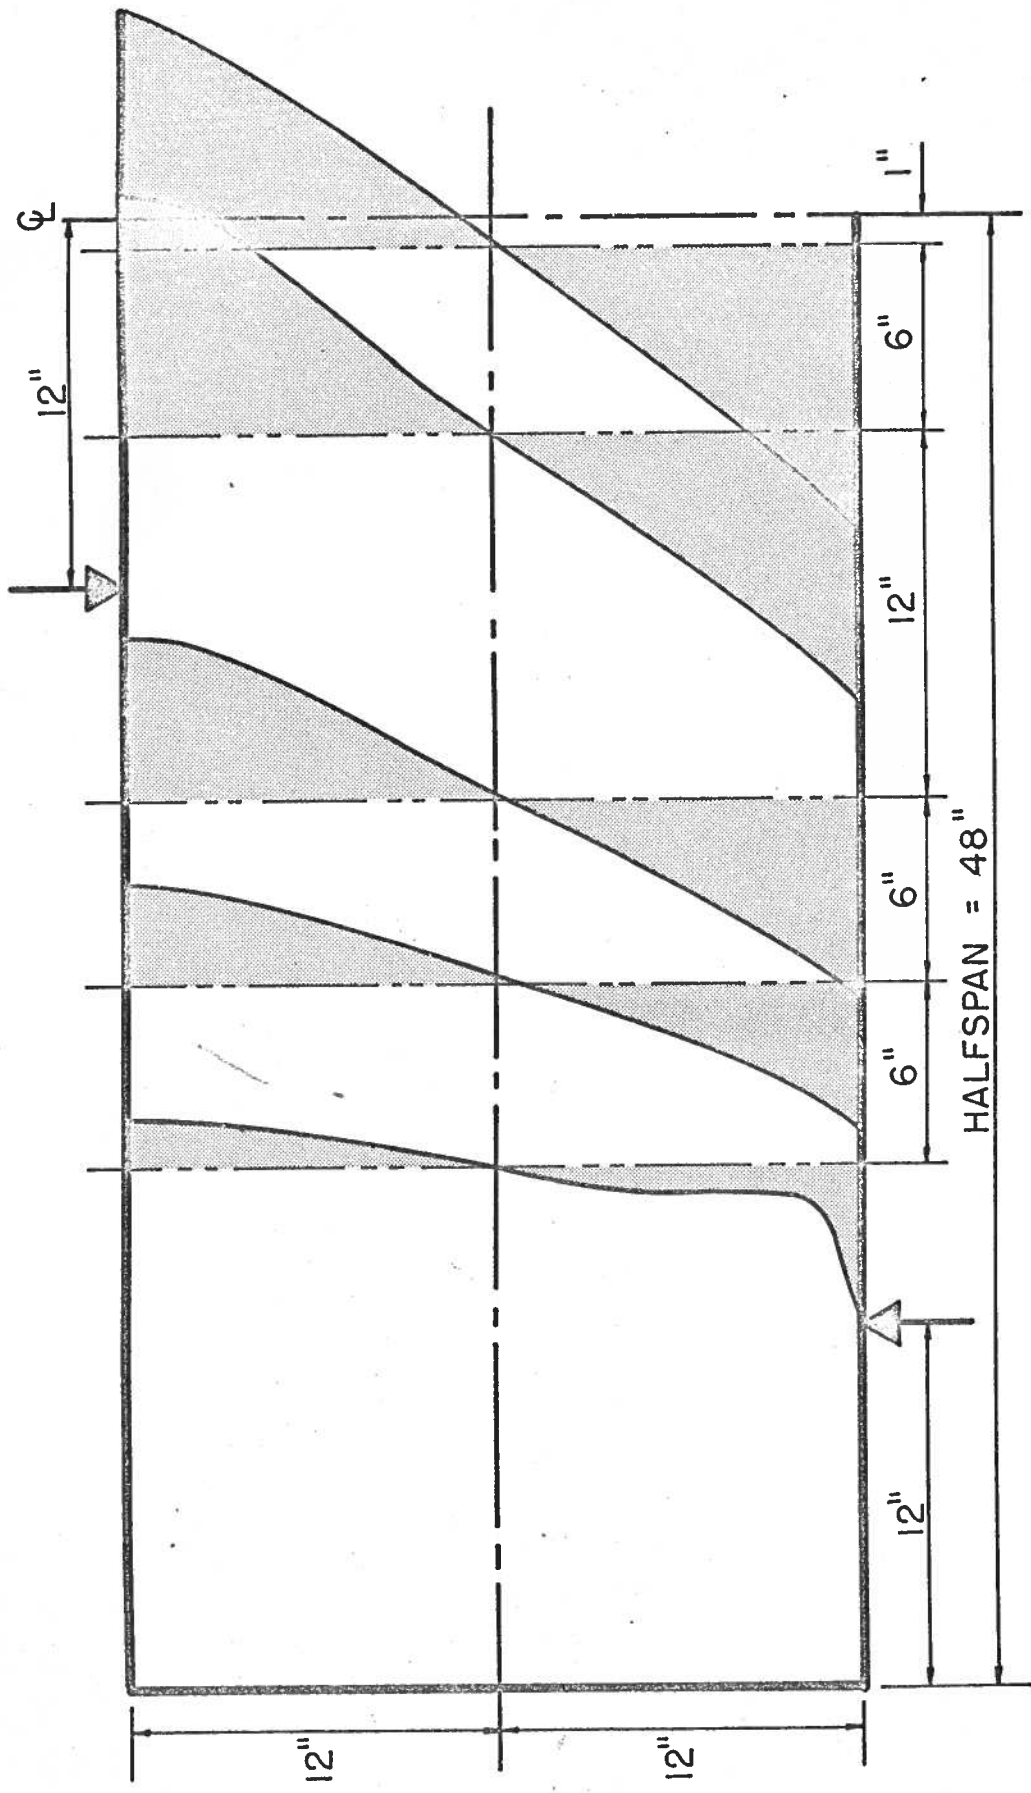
HORIZONTAL STRESSES ON VERTICAL SECTIONS
